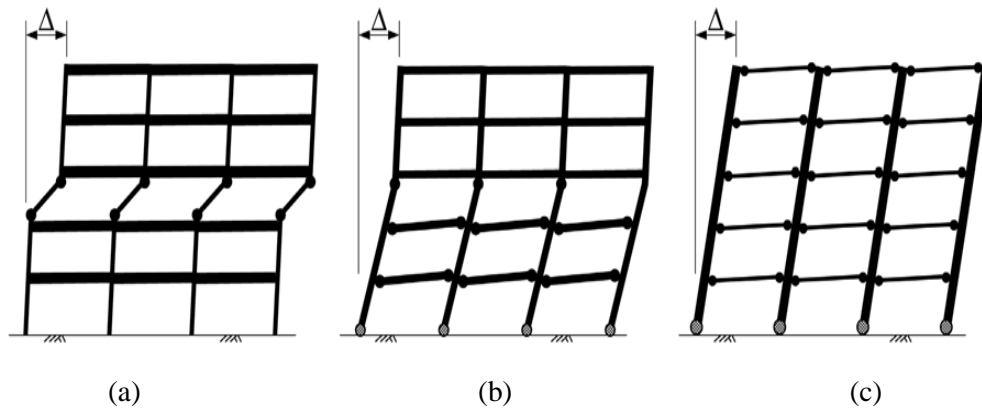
Story mechanism Intermediate mechanism Beam mechanism
